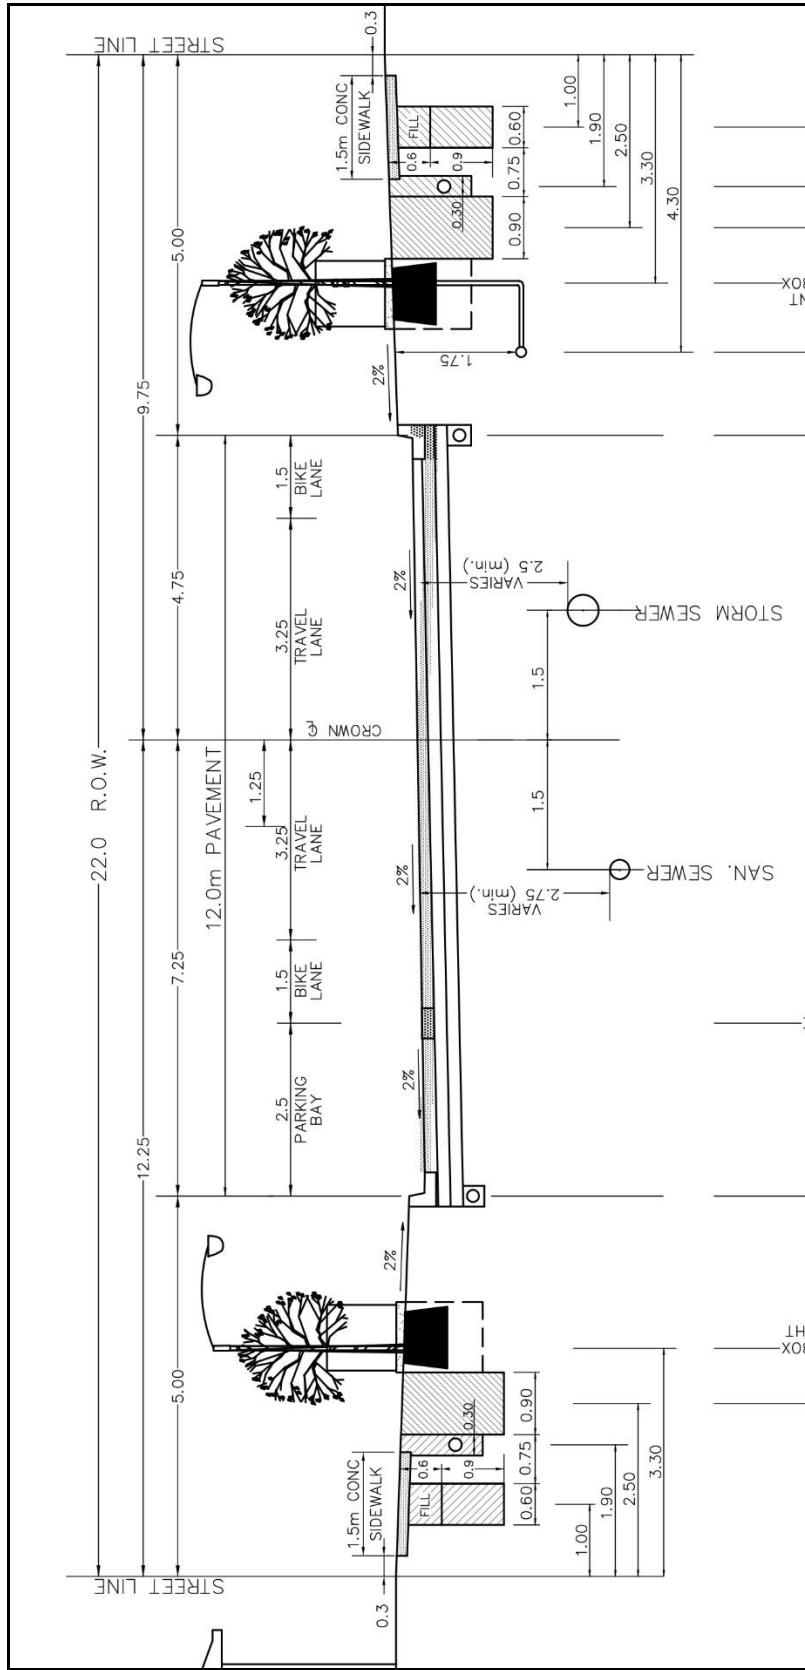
Municipal Road Cross- Section (Yorkton Boulevard)
